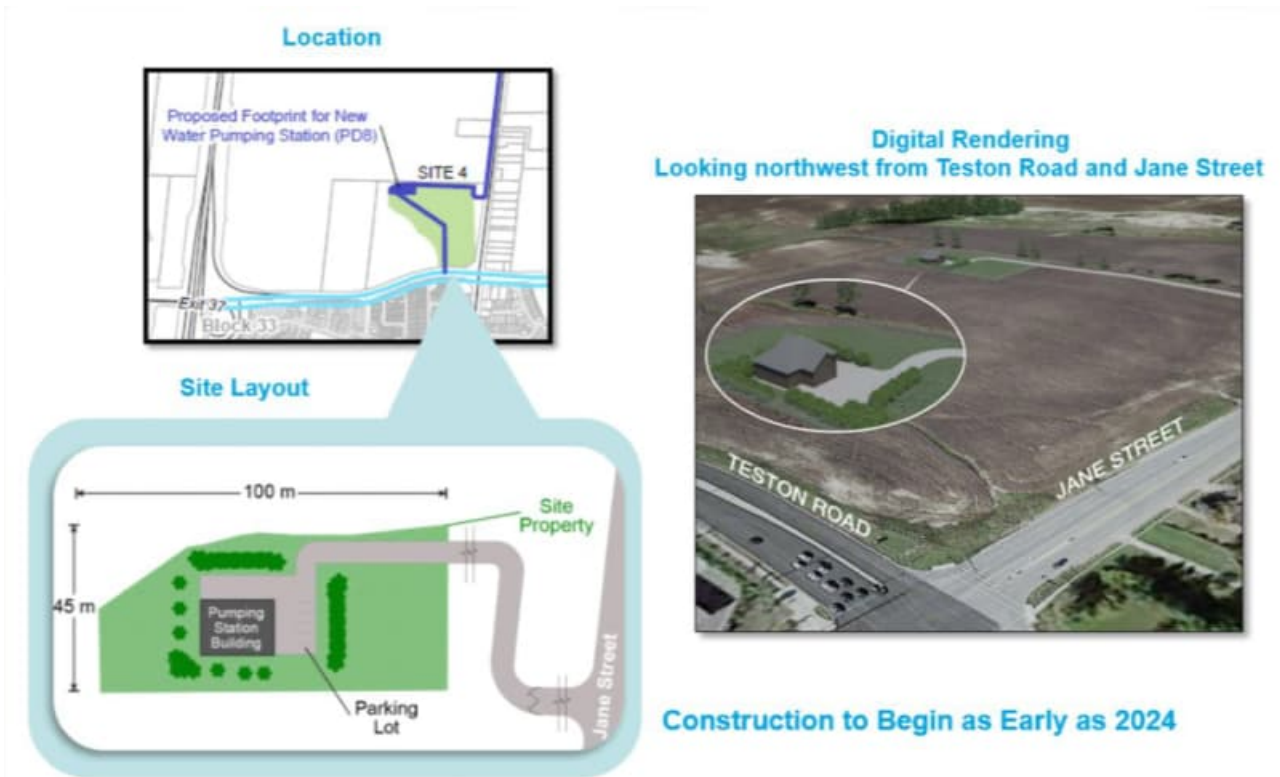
Proposed Footprint, Site Layout and Rendering of the PD8 Pumping Station
